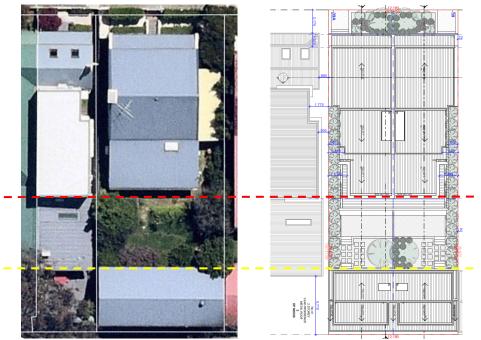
Aerial photograph (left) and proposed site plan (right) showing footprint of previous and proposed structures at no. 39 Westbourne Street, and existing dwelling at no. 41 Westbourne
